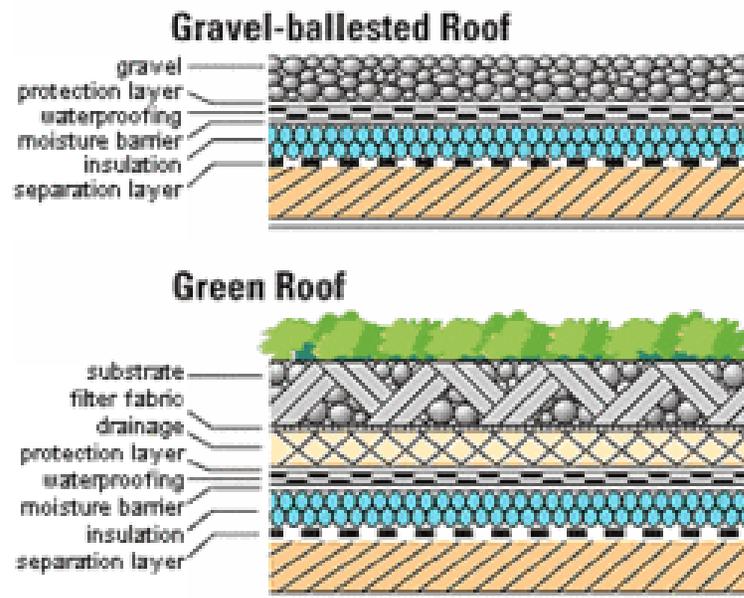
Instead of the gravel as on a conventional roof, a green roof has a drainage layer, filter fabric, and substrate with planting media and sedum. [5]
